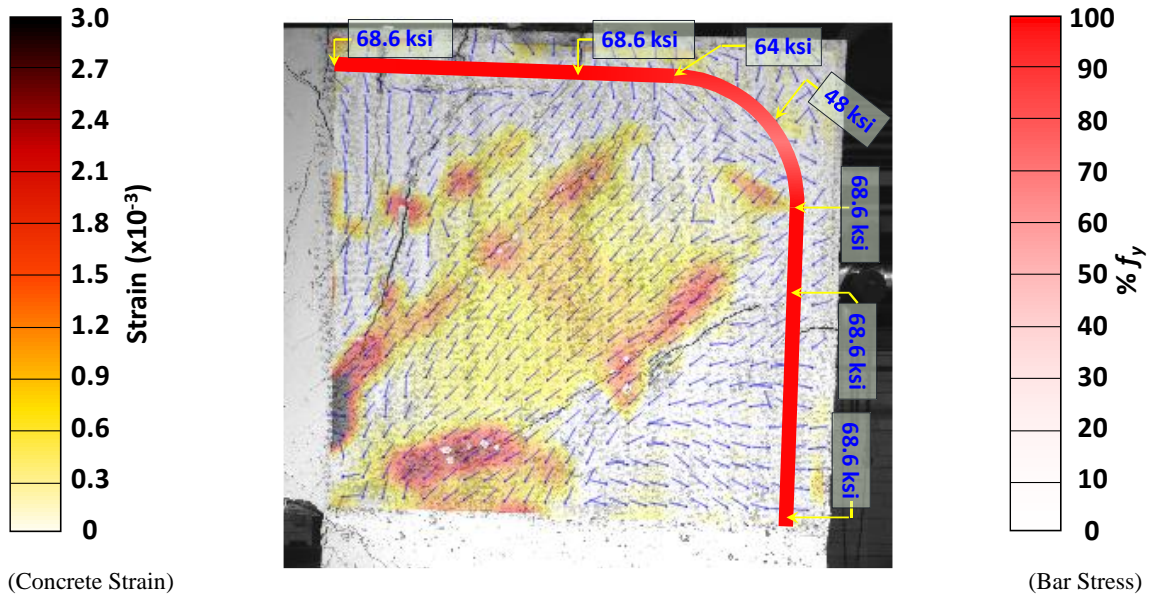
Bar stress distribution and concrete strain in the joint of Specimen A-R11-45
